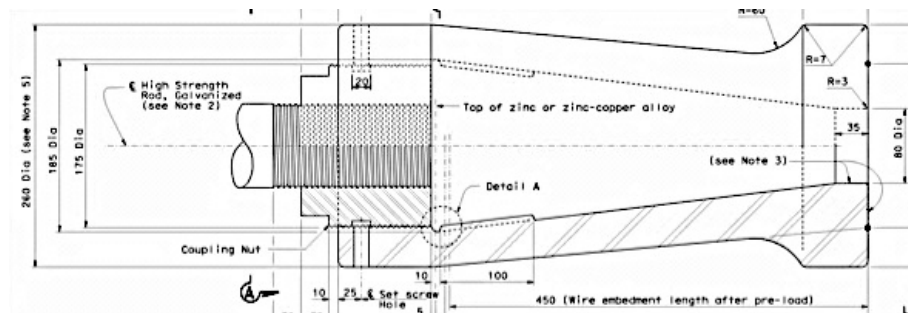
Socket details for east deck cable anchorage (Ref.: Caltrans drawings 737/1204).
